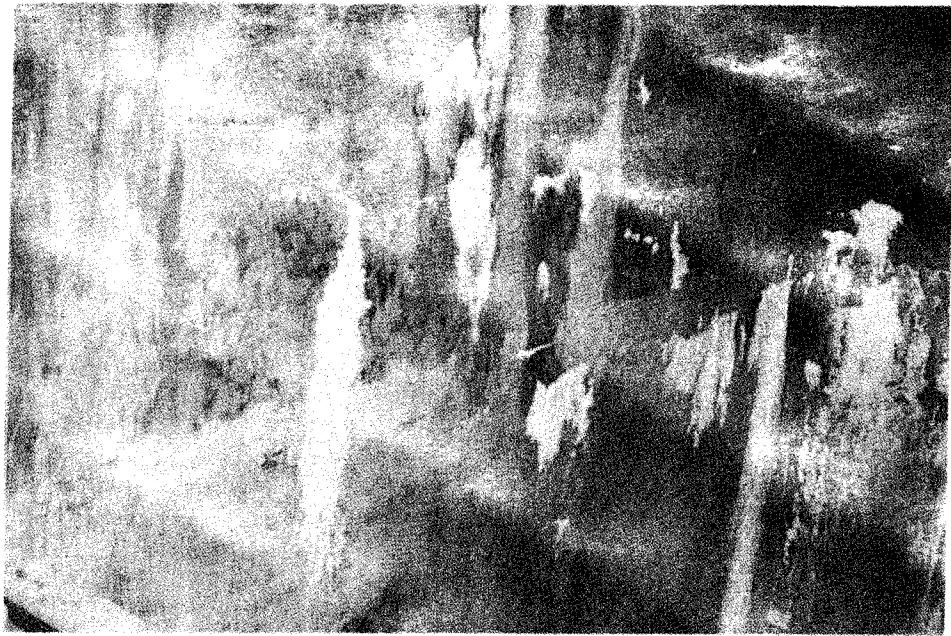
Area of interior wall treated with Vandex, Beltzville Dam, June 1983
